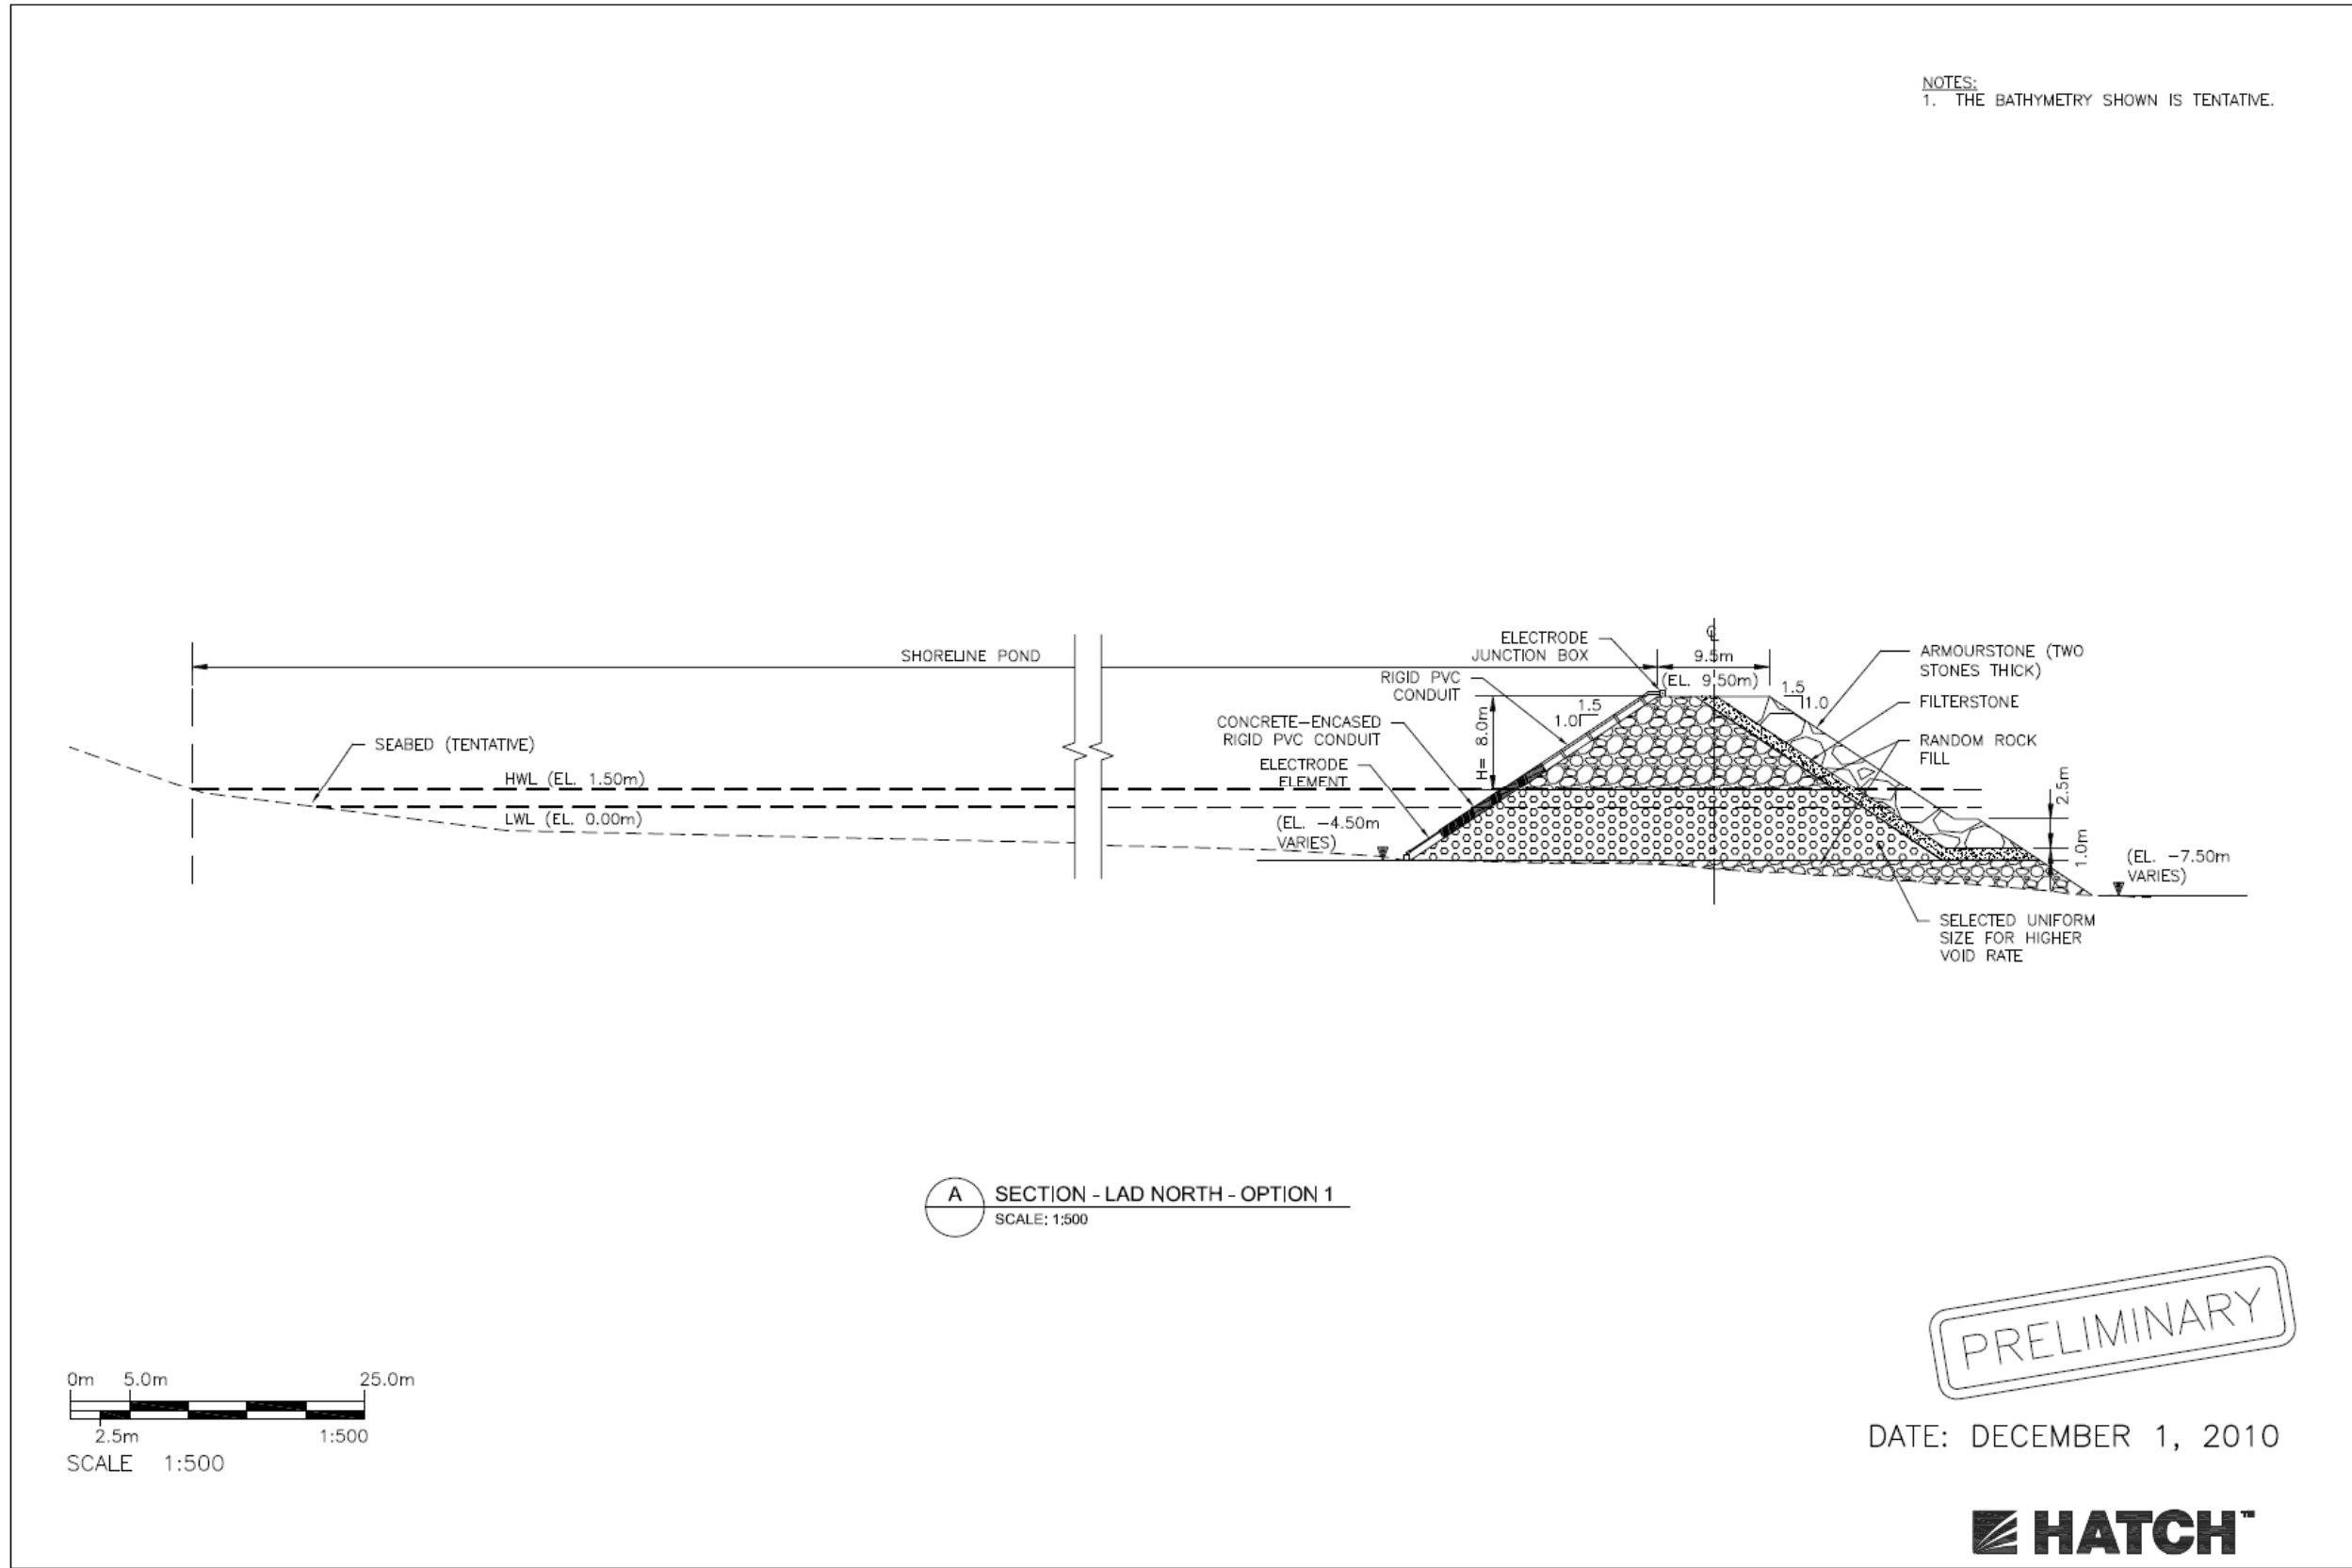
LAD North Shoreline Pond and Breakwater Cross Section
